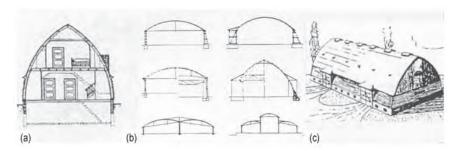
Lamella roofs for (a) housing, (b) halls and (c) barns [5].
